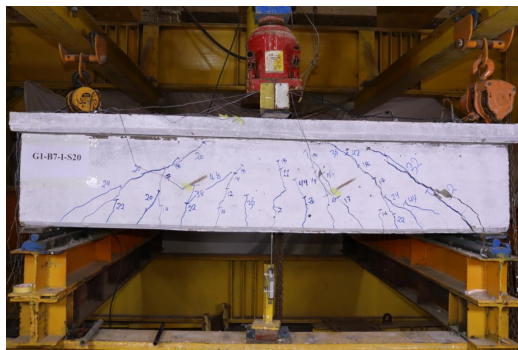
Failure crack pattern of specimen G1-B7-I-S20.
